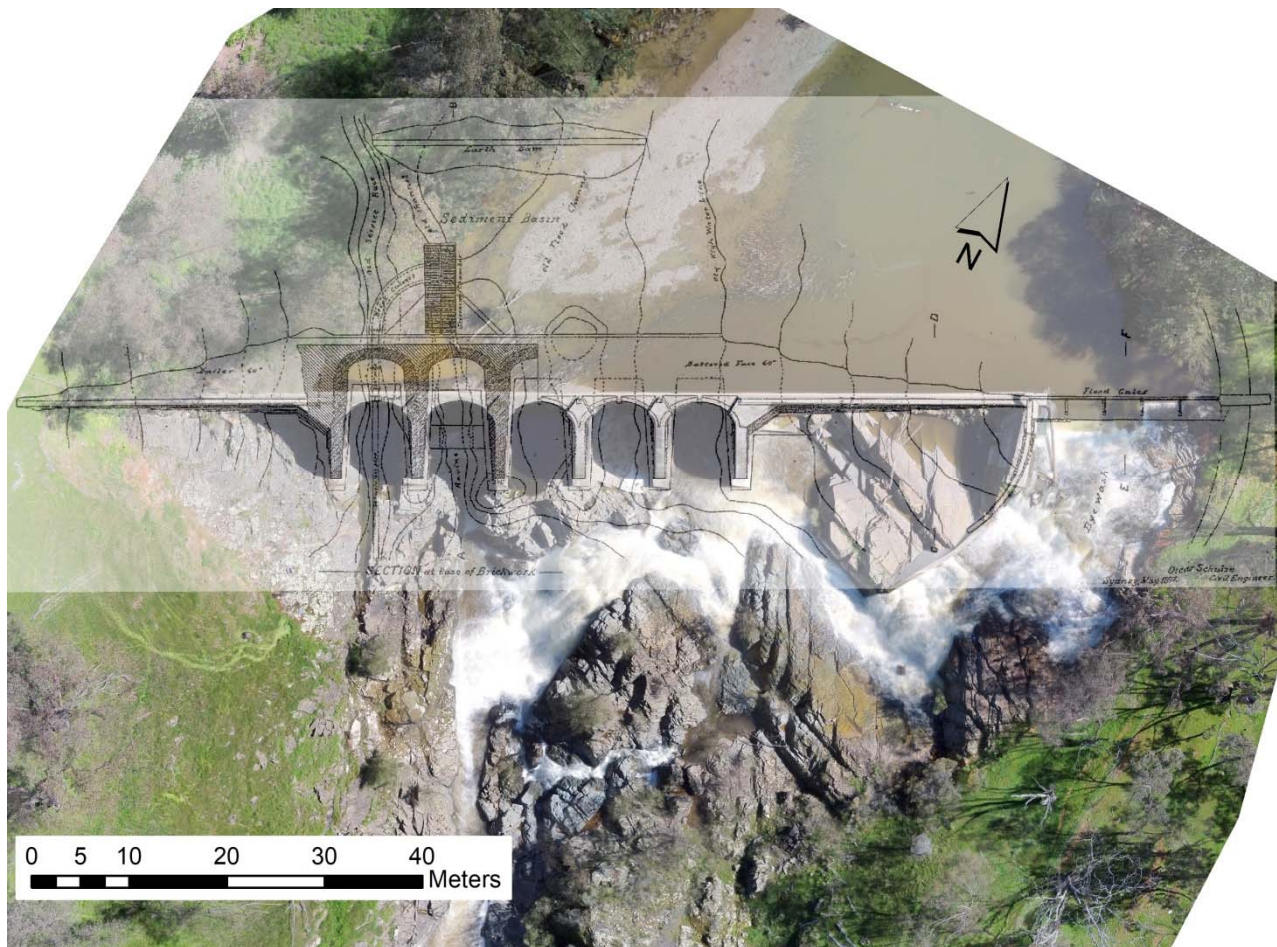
Original dam plan drawings overlain Oct 2016 aerial photography
